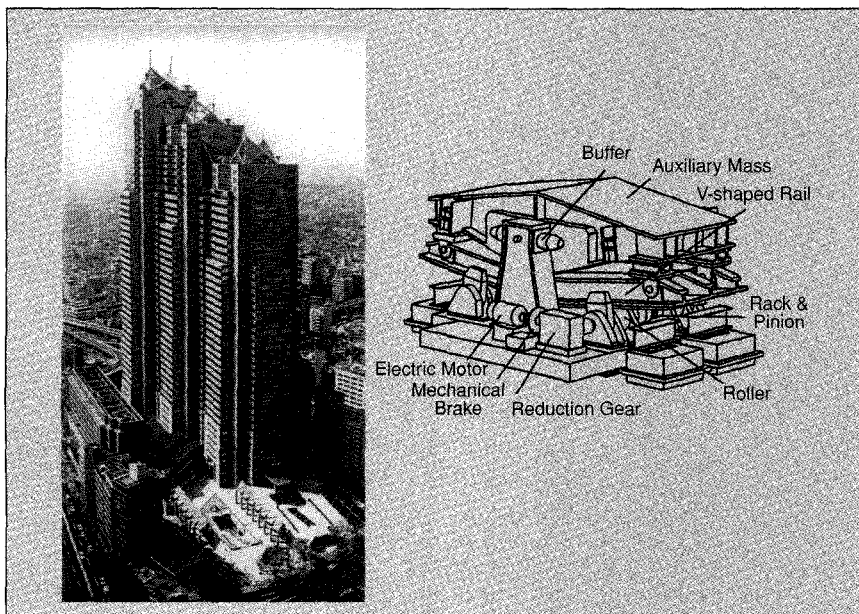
Shinjuku Park Tower. Fig. 5b. V-Shaped hybrid mass damper employed in the Shinjuku Park Tower.
